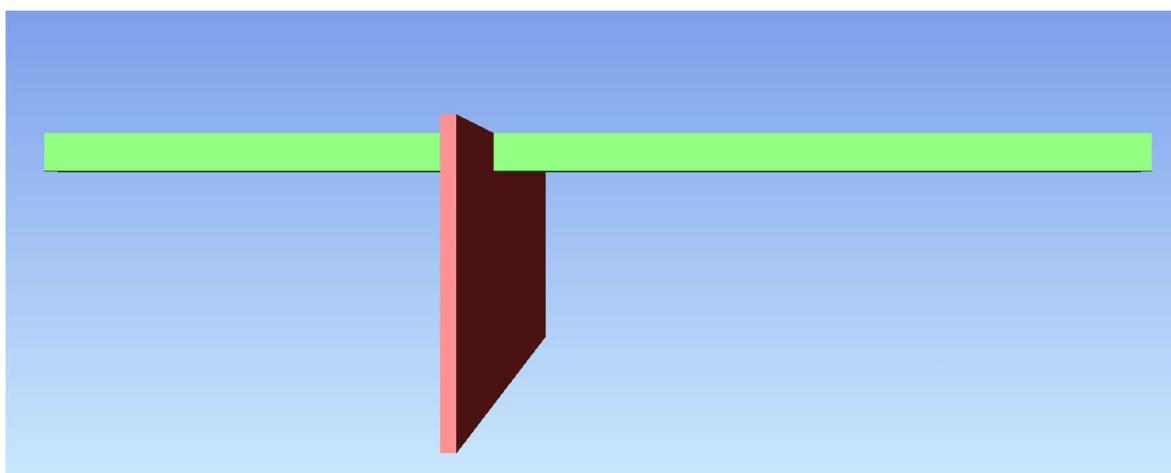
Medium Clash of Architectural wall (Element ID 1316) vs Structural secondary beam (Element ID 181270) – Back Side View
